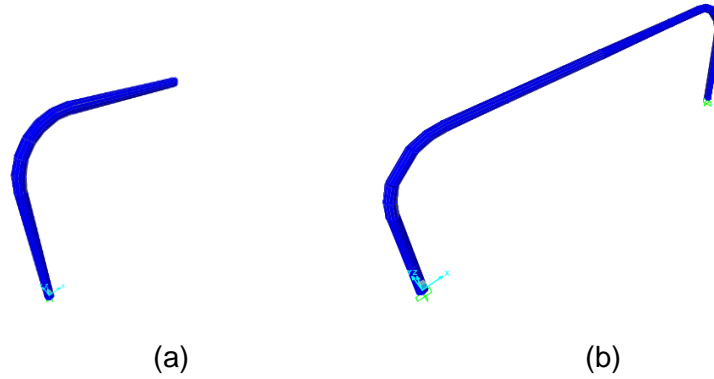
State of Colorado sign structure models: (a) cantilevered; and (b) bridge-type examples.
